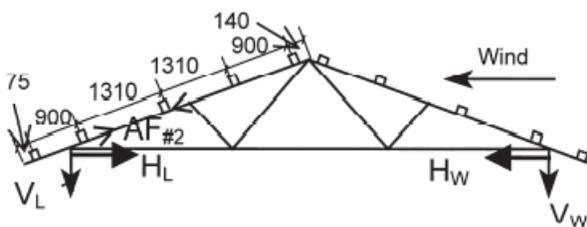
Roof design – containing truss components, batten positions and breakdown of loads in the x and y directions.
